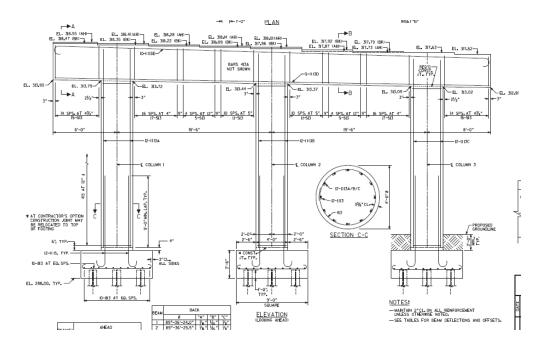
Drawing. Abutment drawings for Span 14 of Bridge 11B
